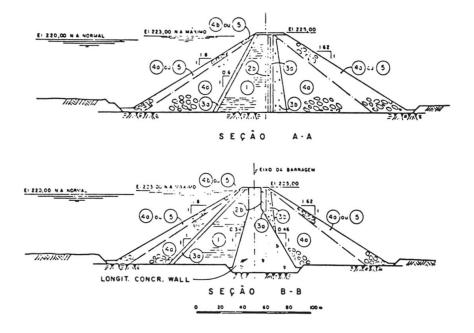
Cross-sections of overlap between rockfill dam and main (concrete) dam
